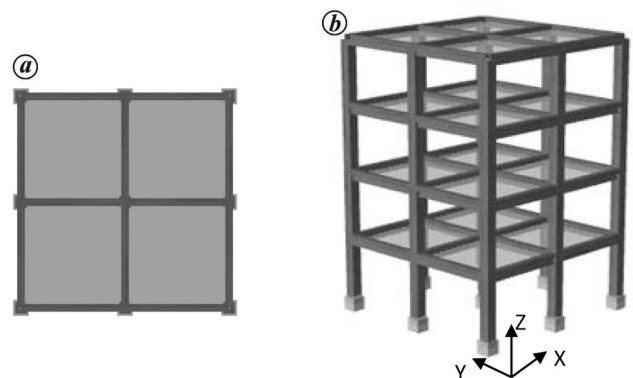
Building model considered: (a) typical building plan and (b) 3D model.
